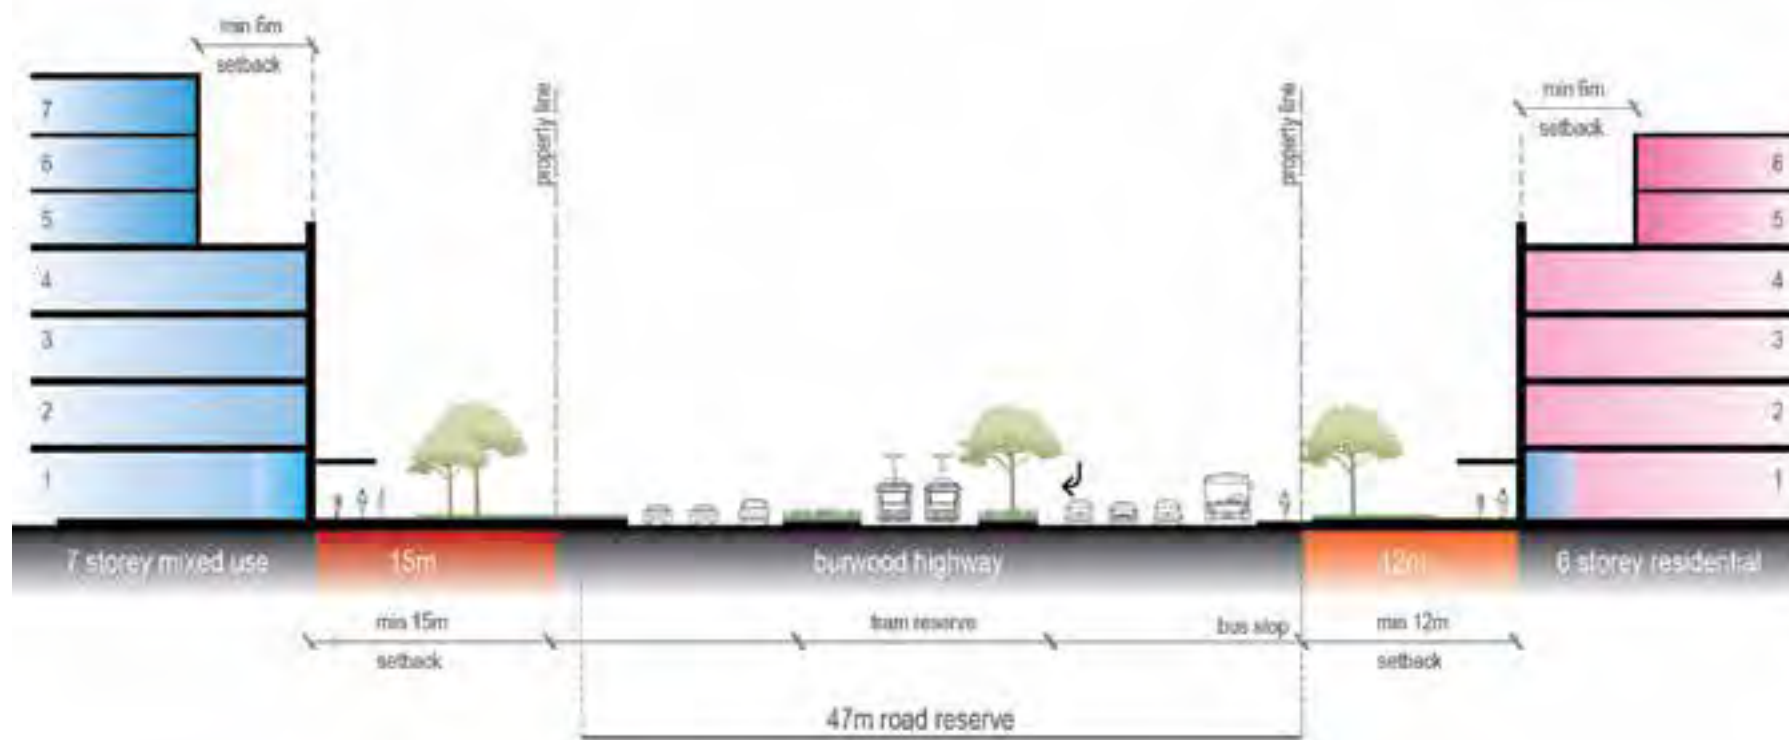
Section Diagram Lewis Road Mixed Use and Burwood Highway South Mixed Use (Section d)
